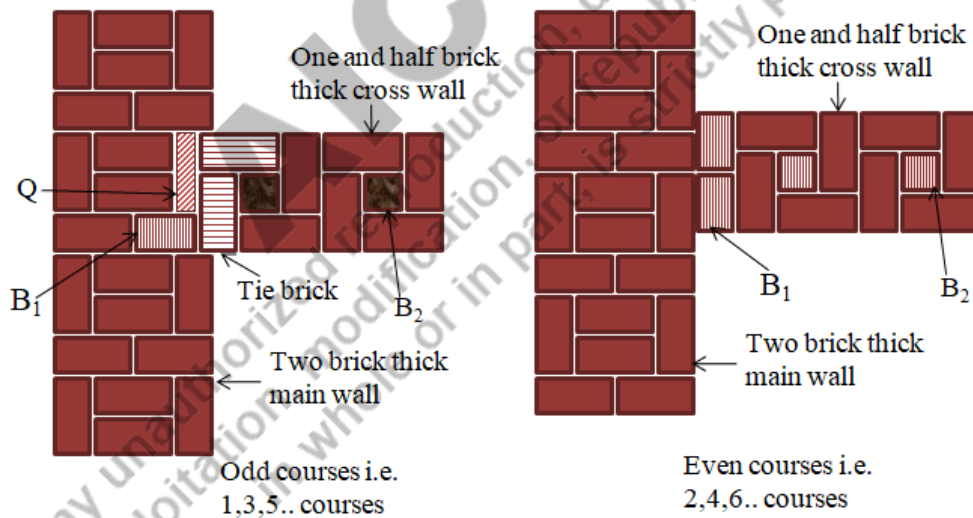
(c) Tee junction between one and a half brick thick wall and two brick thick wall in Flemish bond
